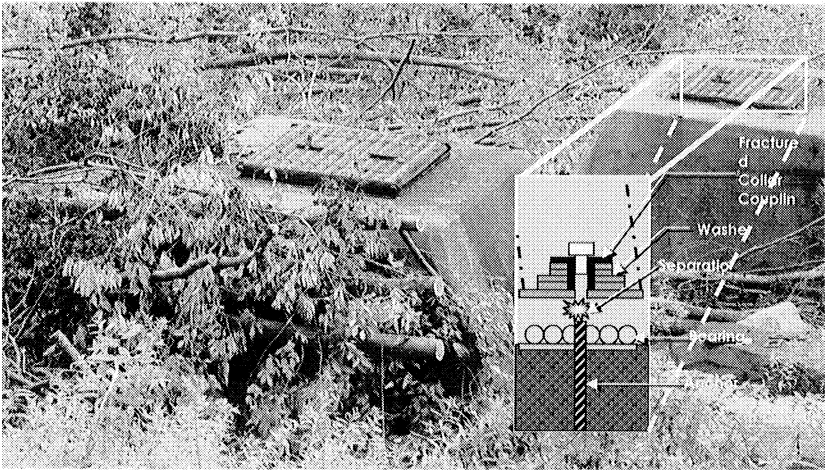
Illustration of separation failure at substructure/superstructure interface
